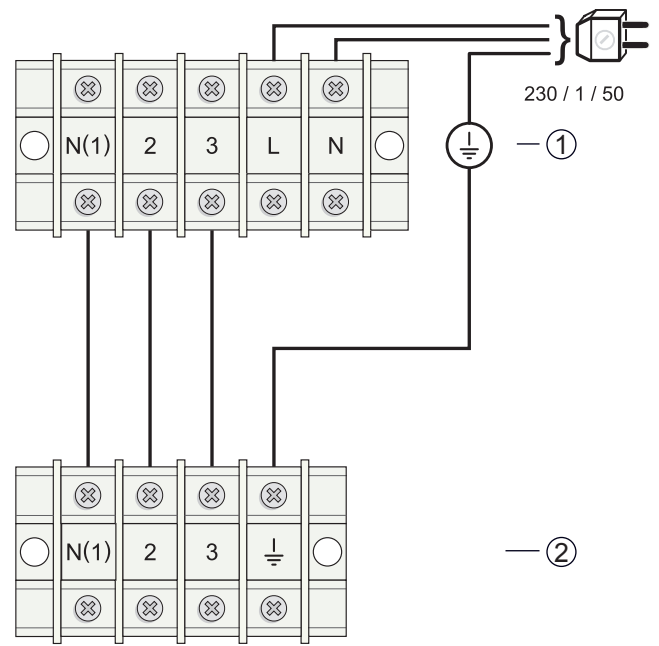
Electrical layout for outdoor and indoor connection for VAI 3-050 WN
